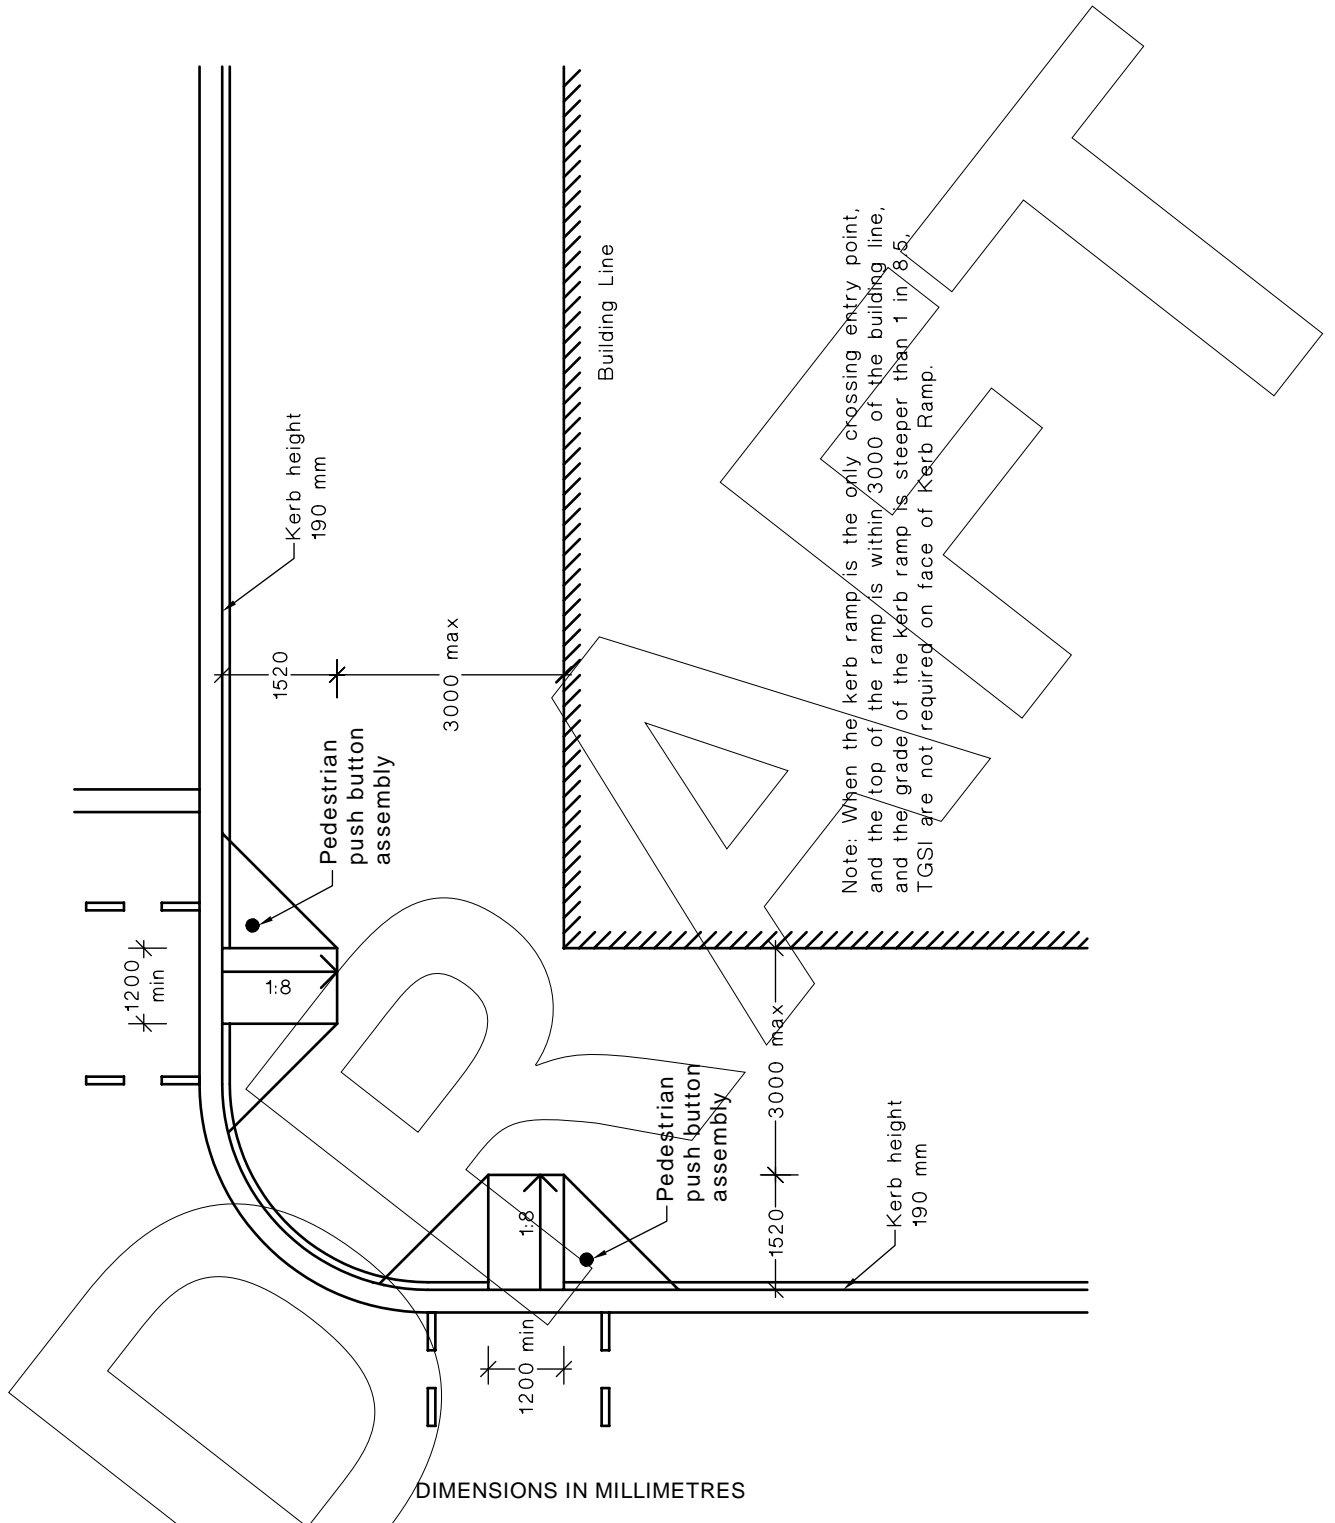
(A) RIGHT ANGLE INTERSECTION, 190 KERB HEIGHT, 90° 1:8 KERB RAMPS, TOP OF RAMP WITHIN 3000 OF THE BUIDLING LINE
